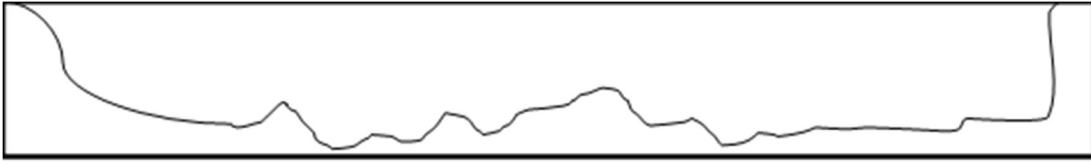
Typical corrosion pattern in a steel girder
